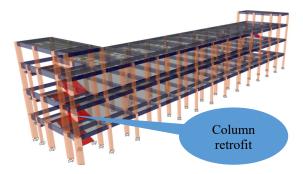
The 3-D modeling of the retrofitted SMPN 25 Padang building with concrete jacketing
